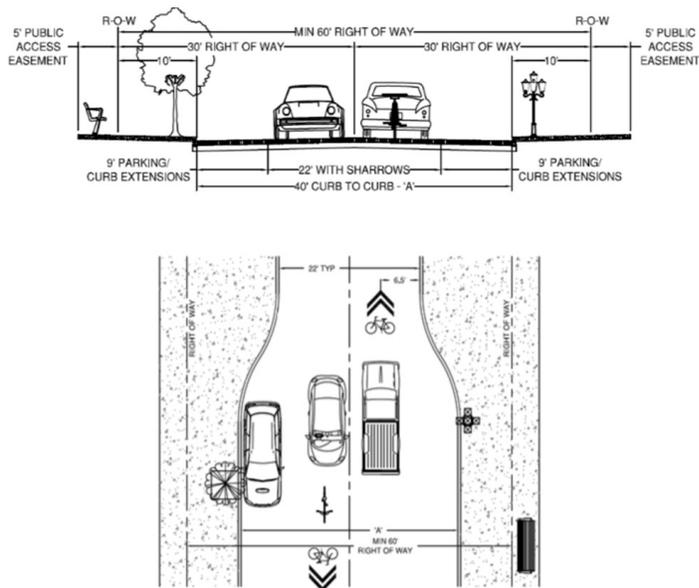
APPLIES TO FOURTH STREET NORTH OF GREENWOOD AVENUE
